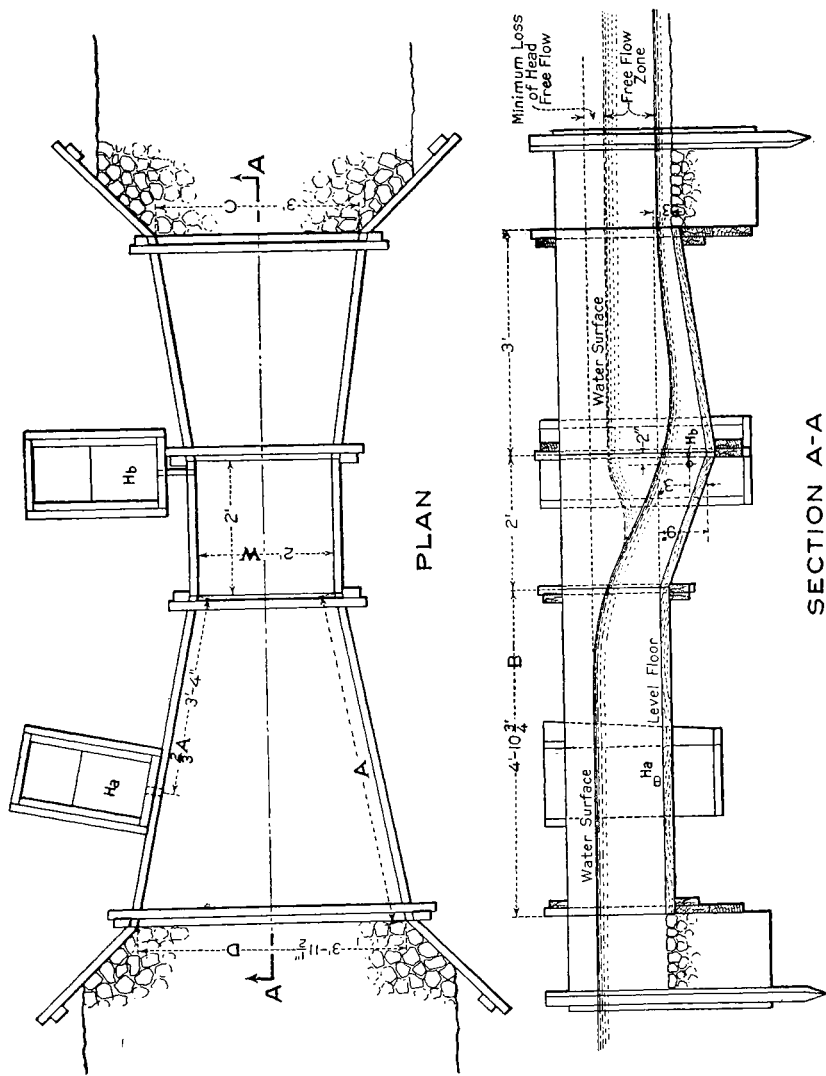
Plan and Elevation of 2-foot Improved Venturi Flume Showing Suggestions as to Construction.
